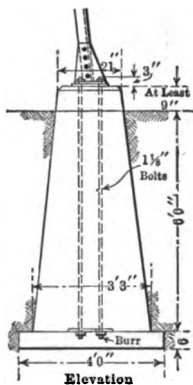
Flexible tower. FIG. 59.—Concrete anchor for steel tower.
